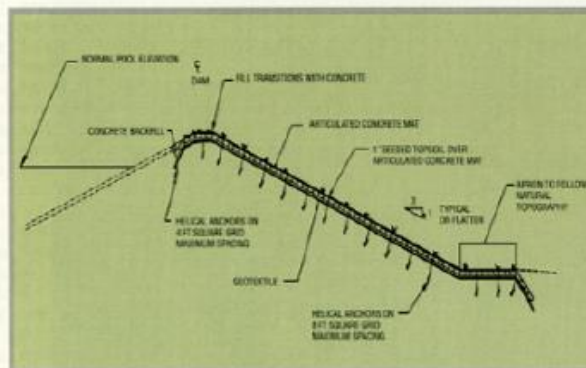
This is a typical cross-section of an embankment dam protected along the crest and downstream slope with an ACB system.
